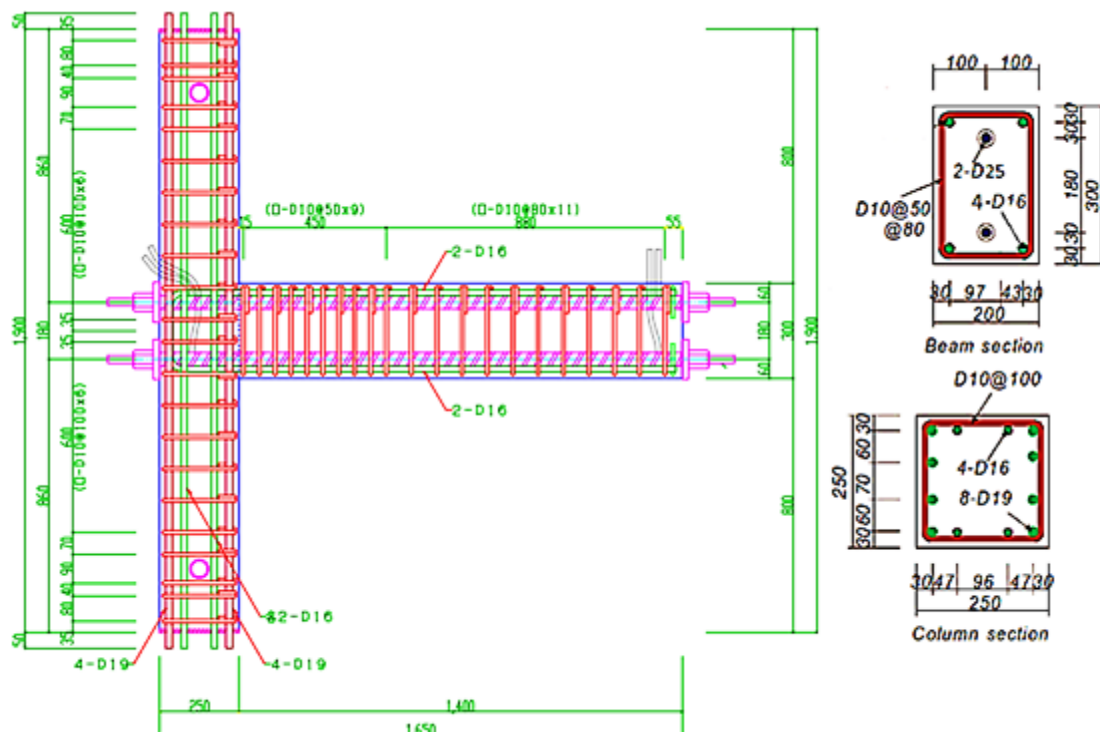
Sectional detail, and reinforcement layout for PPC exterior BCJ
